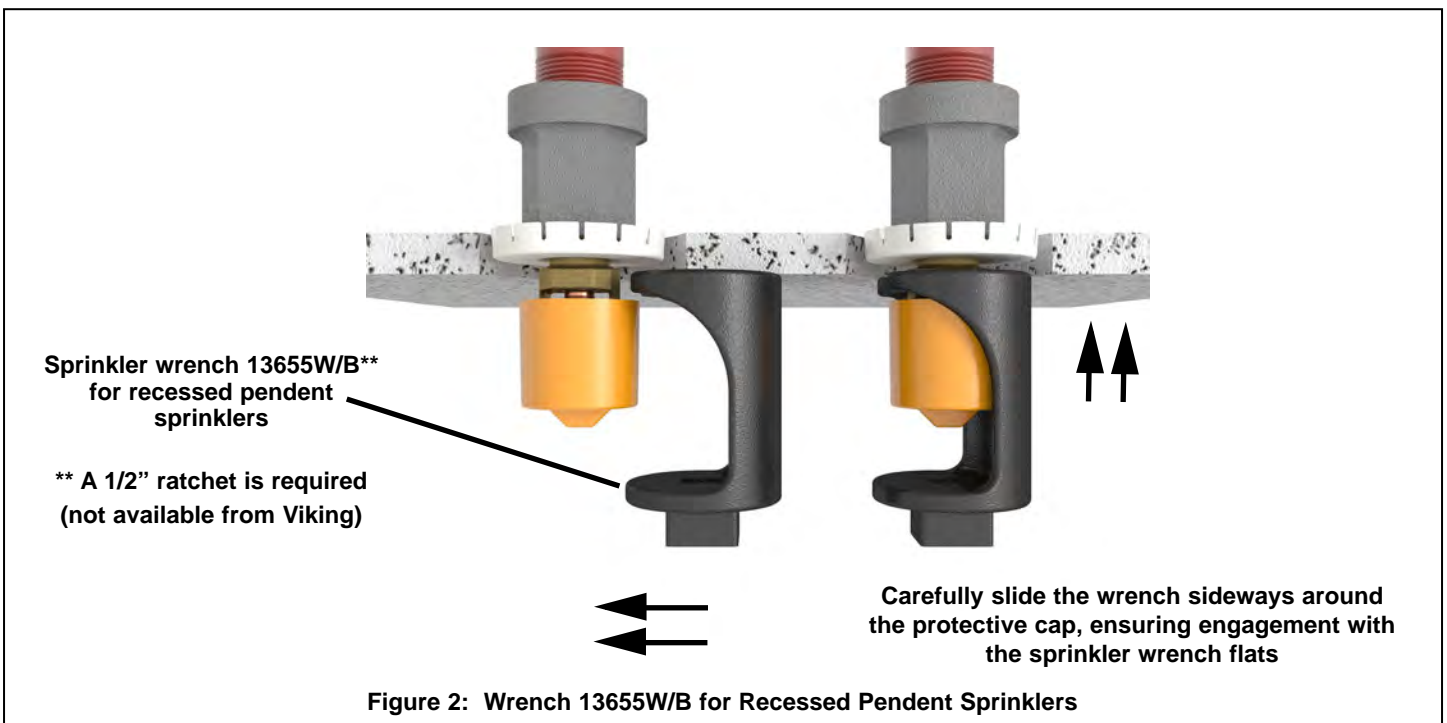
Wrench 13655W/B for Recessed Pendent Sprinklers
